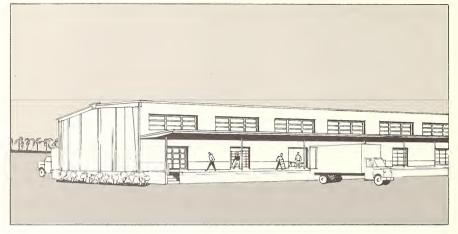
Design for a multiple-occupancy building for handling wholesale food, San Juan, P.R., 1962.
